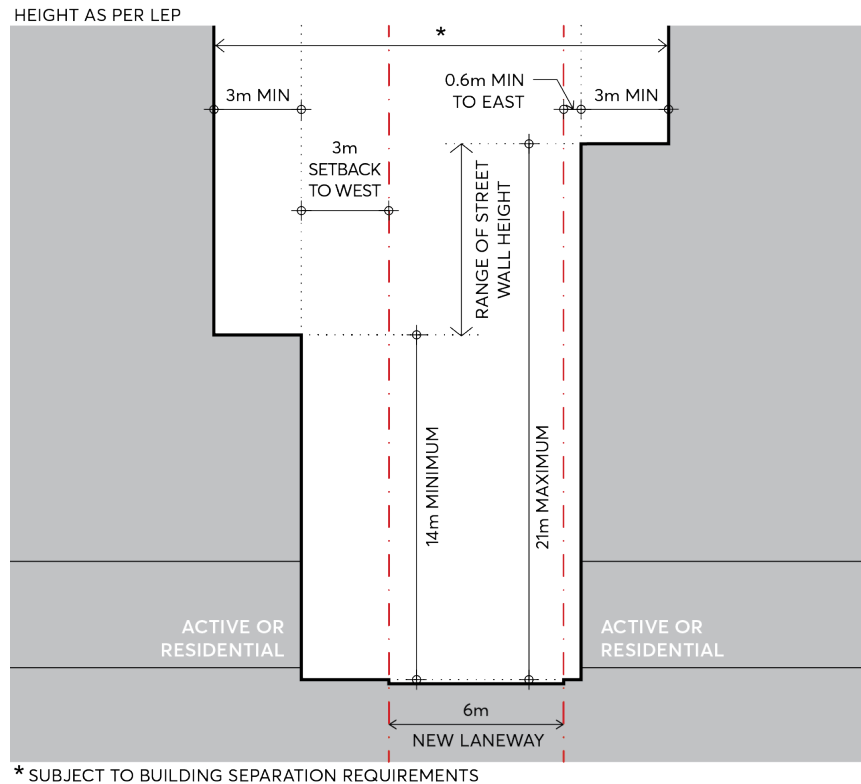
New North-South Laneway (Section E) Setbacks and Street Wall Height
